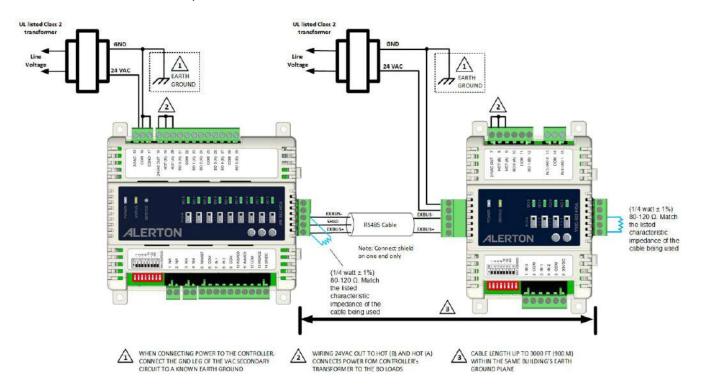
Separate transformers for the controller and I/O modules. Shown above is the VIP-363-HOA Controller connected remotely to a VXIO-322-HOA Expansion Module.
